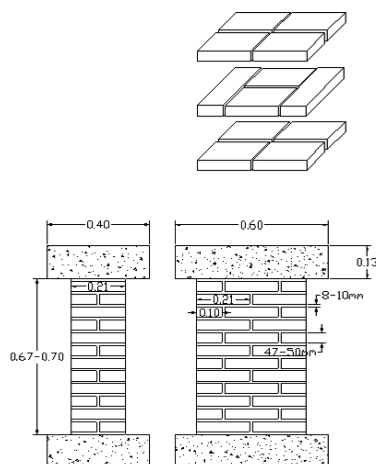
Brick masonry wallettes tested in compression before or after deep repointing, (Vintzileou, 2001).
